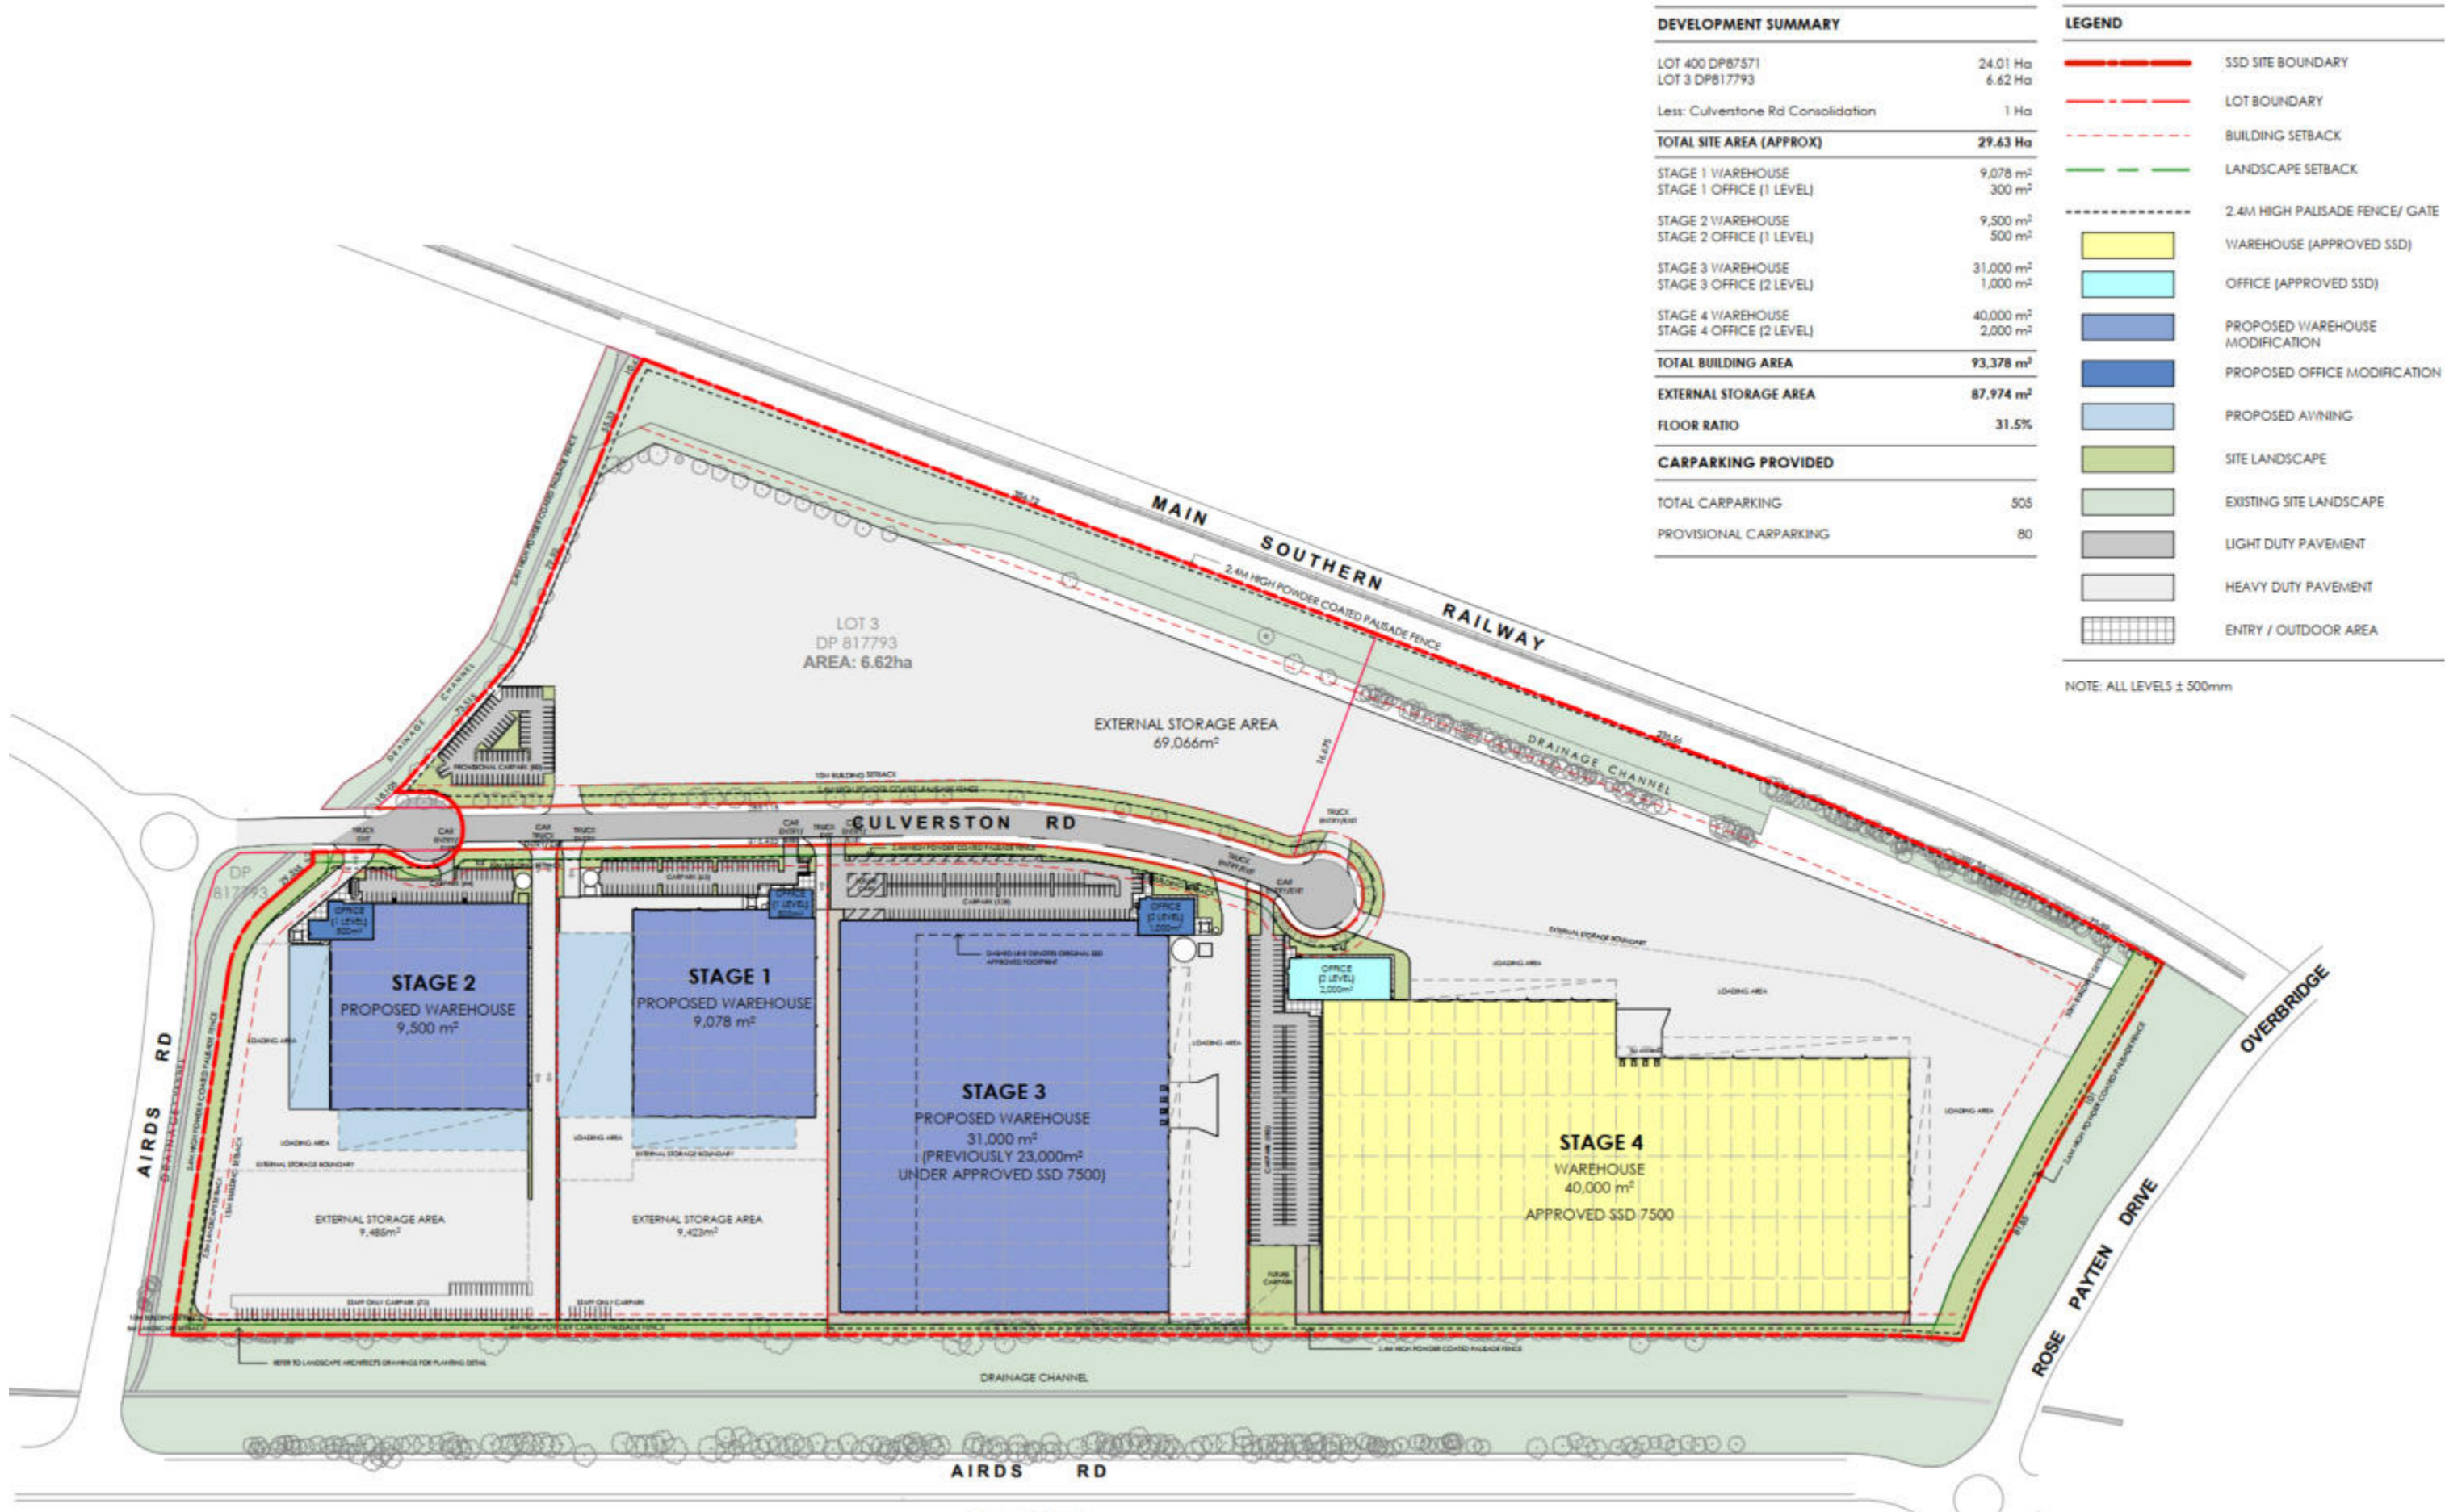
Proposed Master Plan (Watch This Space Design, 2021)
